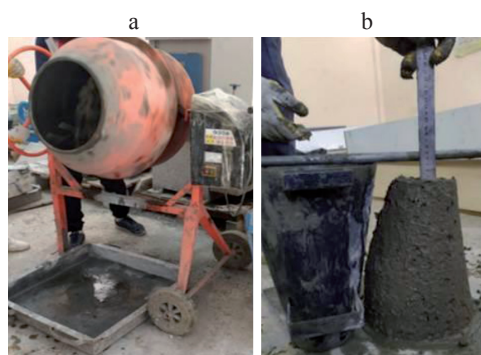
Preparing fresh concrete: concrete mixer (a); lump test (b)
